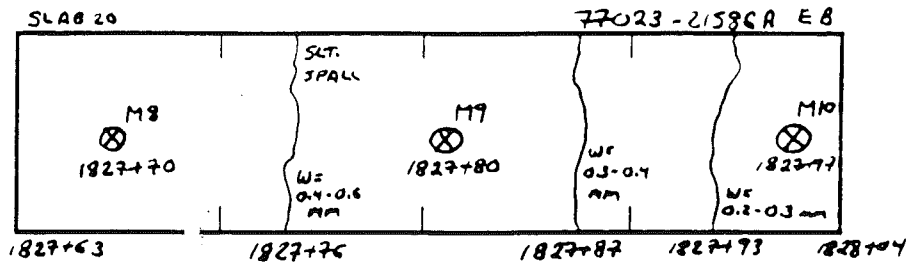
A typical distress survey from section 77023-21586A EB .
